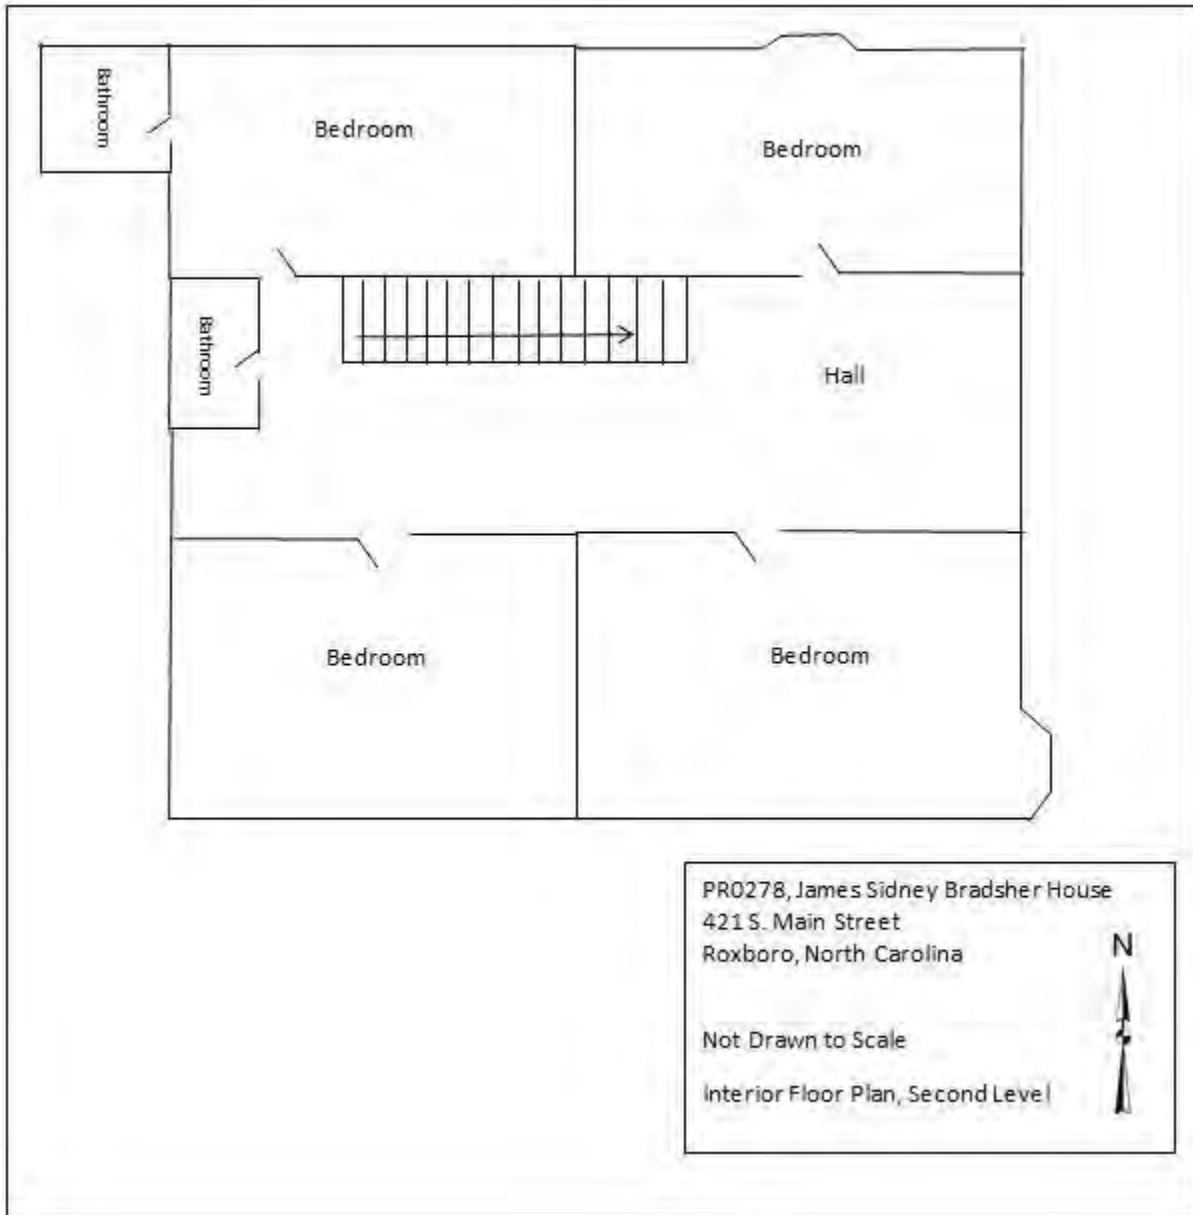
J.S. Bradsher House (PR0278) Interior Second Level Floor Plan.
